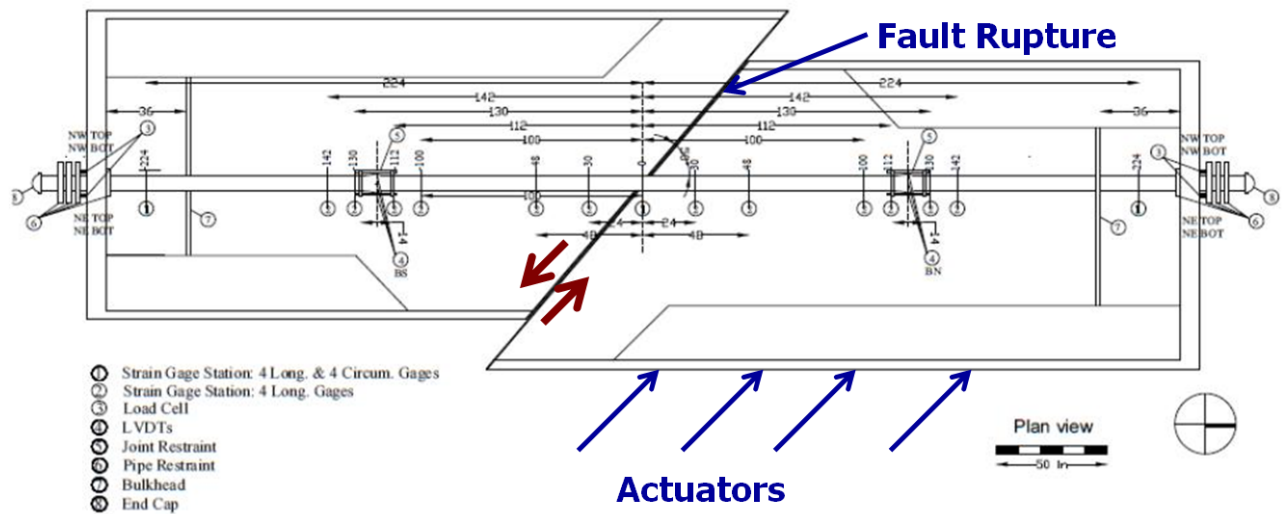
Plan View of IPEX Bionax Pressurized Pipe Centered Specimen in Test Basin
